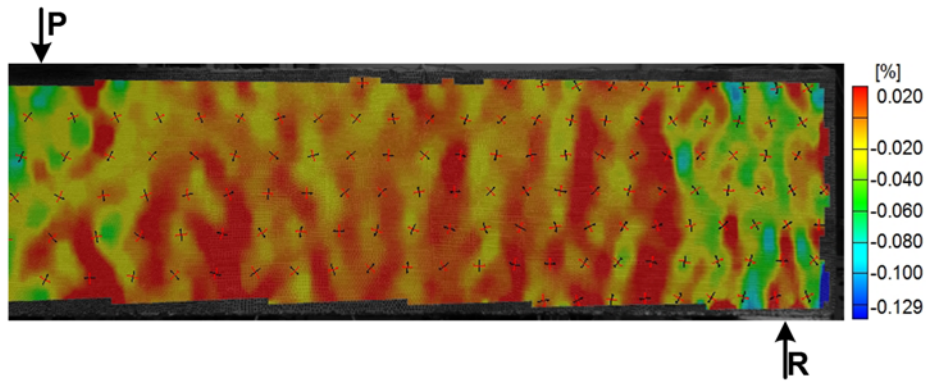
Full-field concrete longitudinal strain ( $\epsilon_x$ ) across shear span for specimen RC18b at load 10 kips
